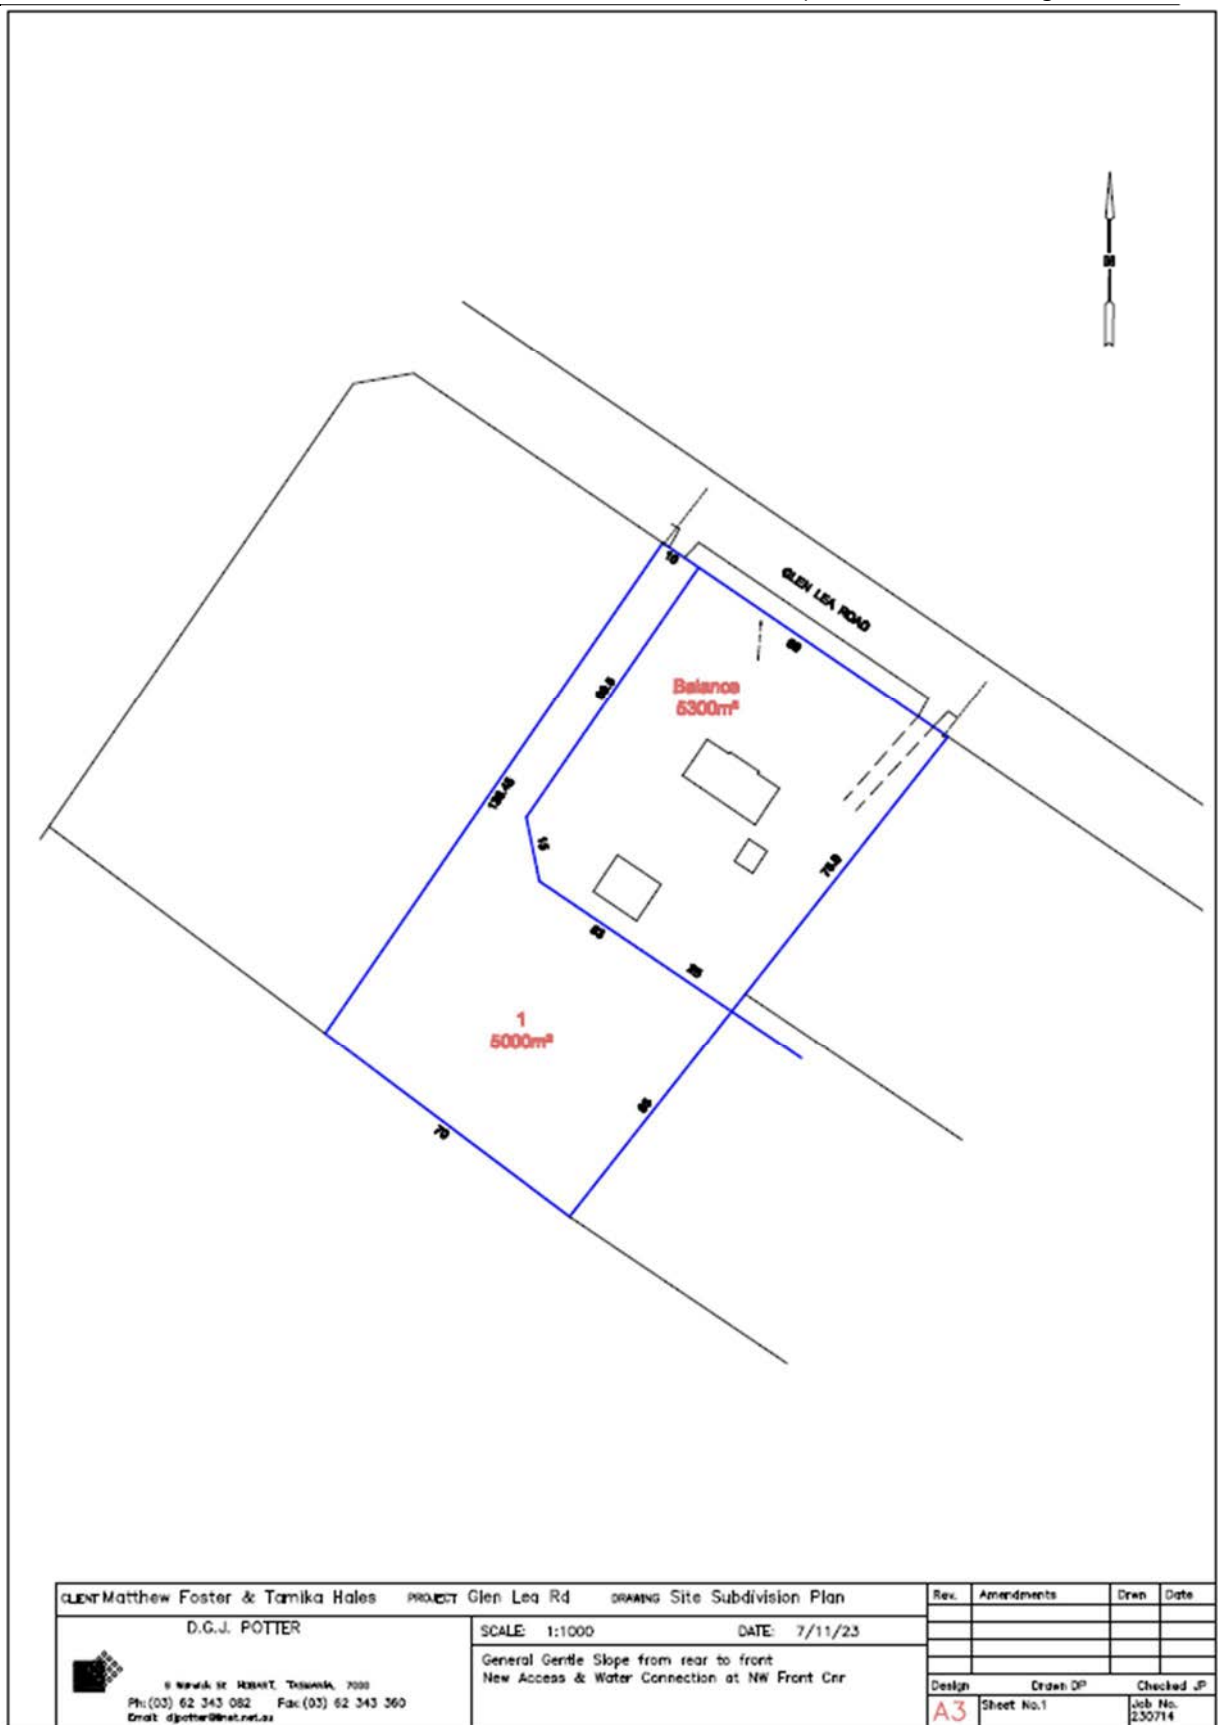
Plan of subdivision for 5 Glen Lea Road, Pontville.
